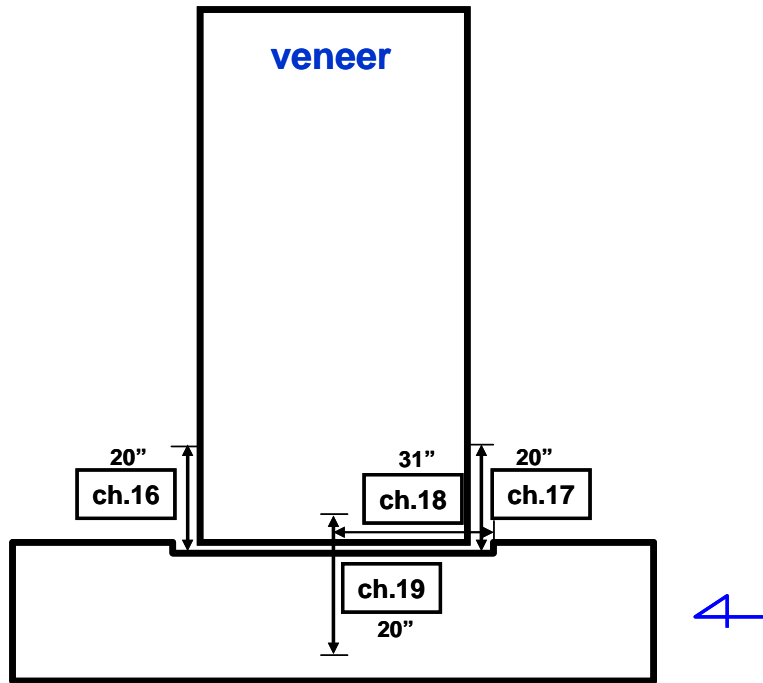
Instrumentation of quasi-static, in-plane CMU wall specimens (veneer side)
